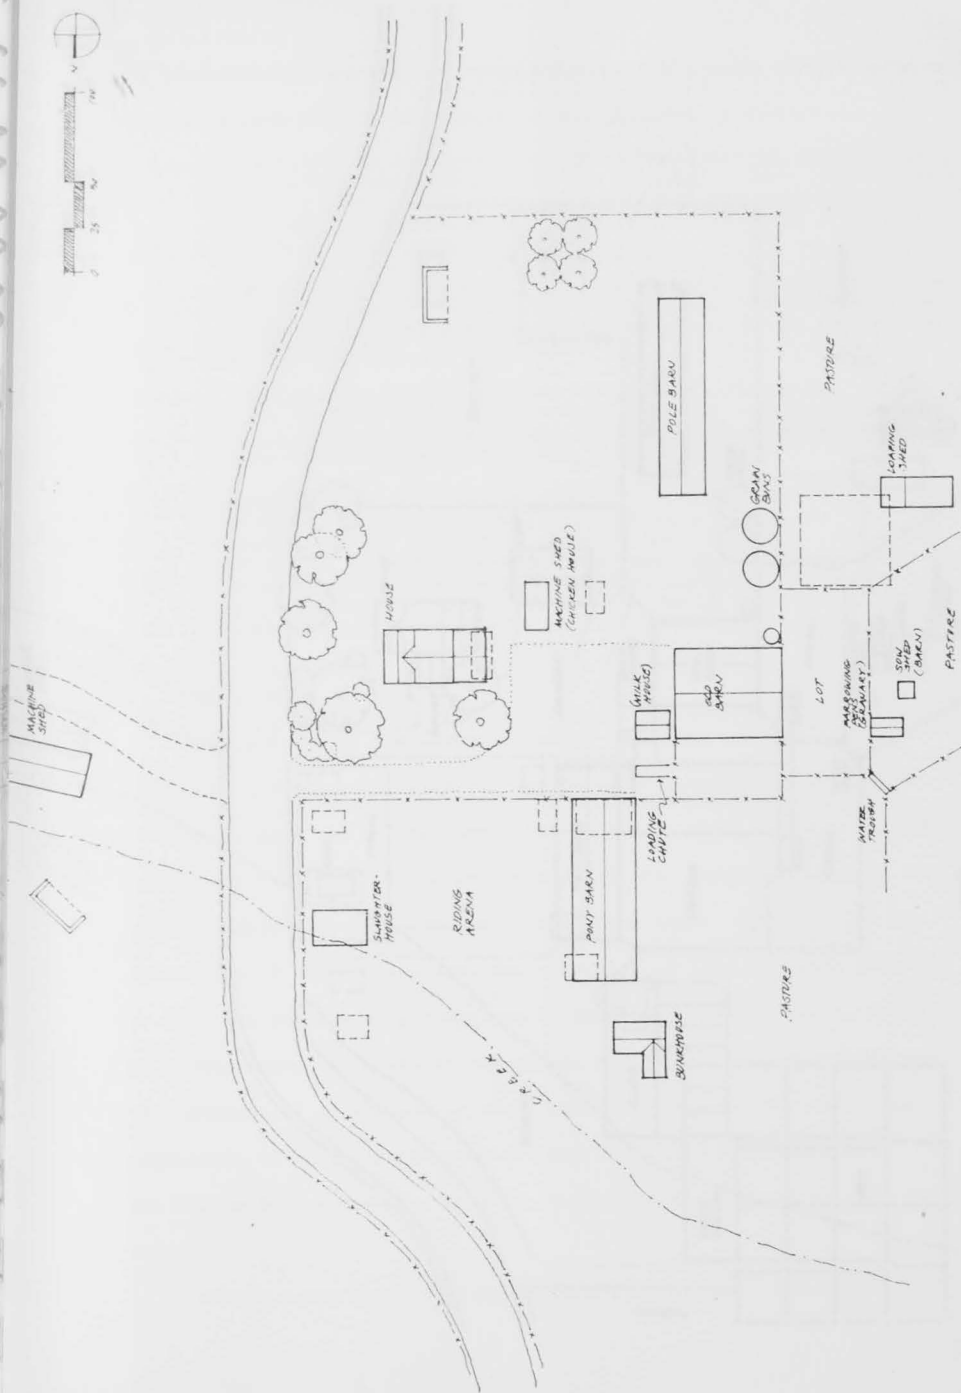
Site #1 - Farm site plan, 1955 - 1975.
